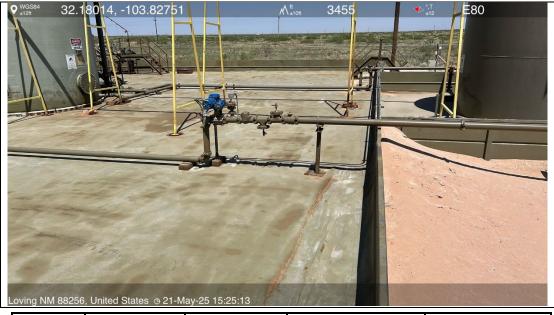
/21/2025	Direction Facing	east	Photo 4
